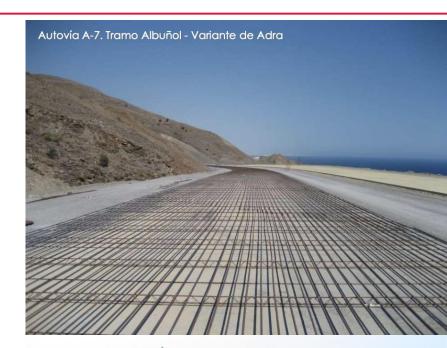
Continuously reinforced concrete pavement (CRCP) (courtesy: ACPA).
